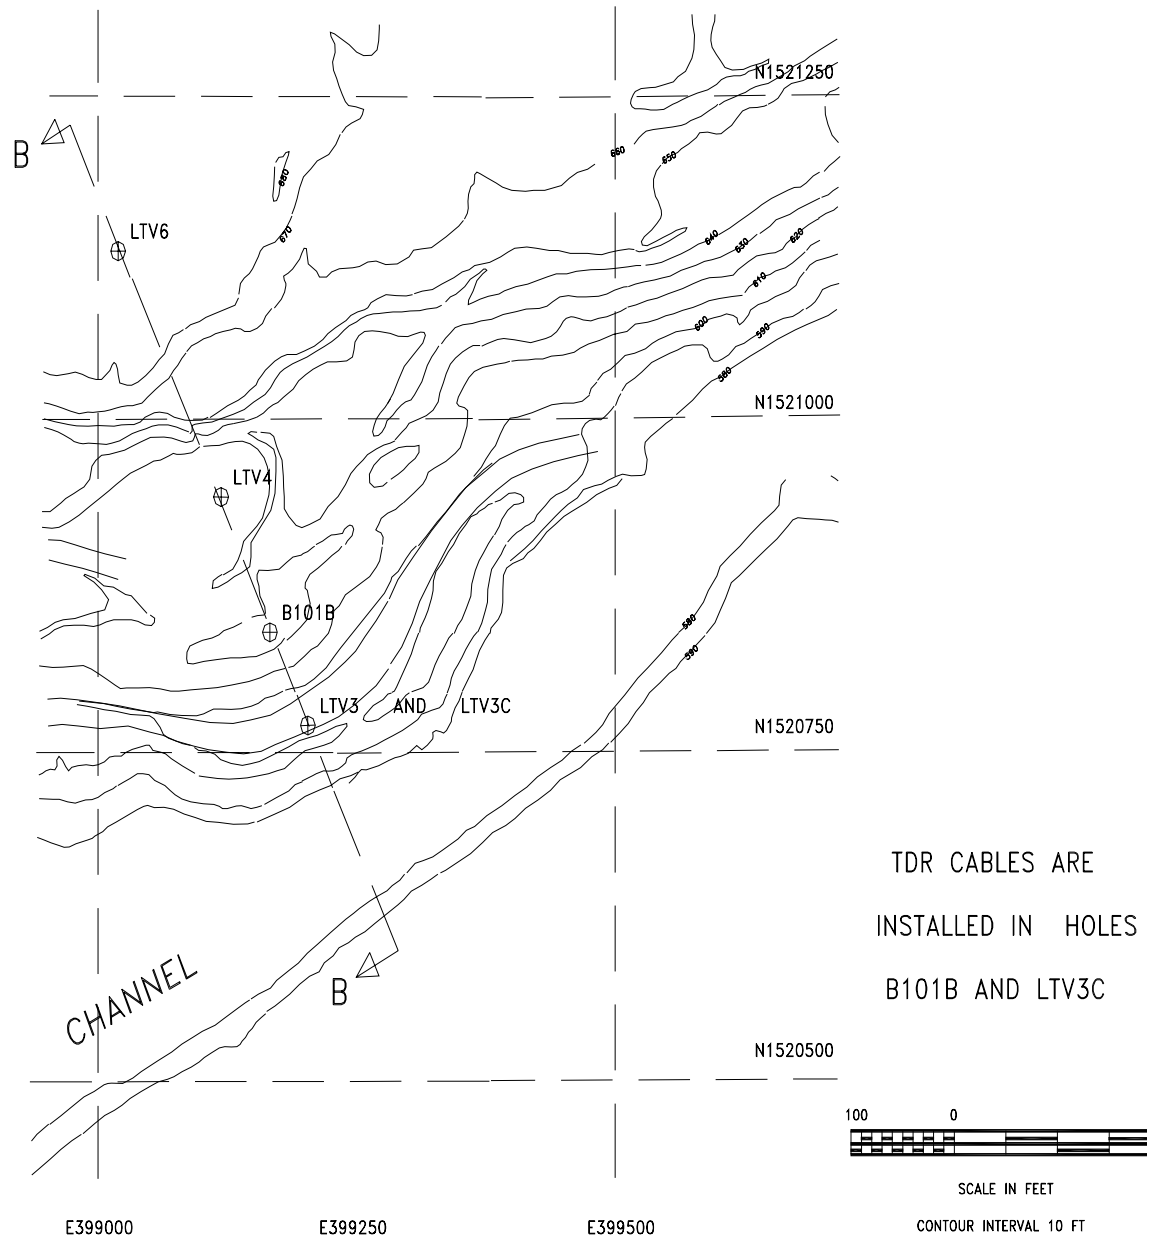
TDR and Slope Inclinometer hole location at the Clark Landfill, IN.
